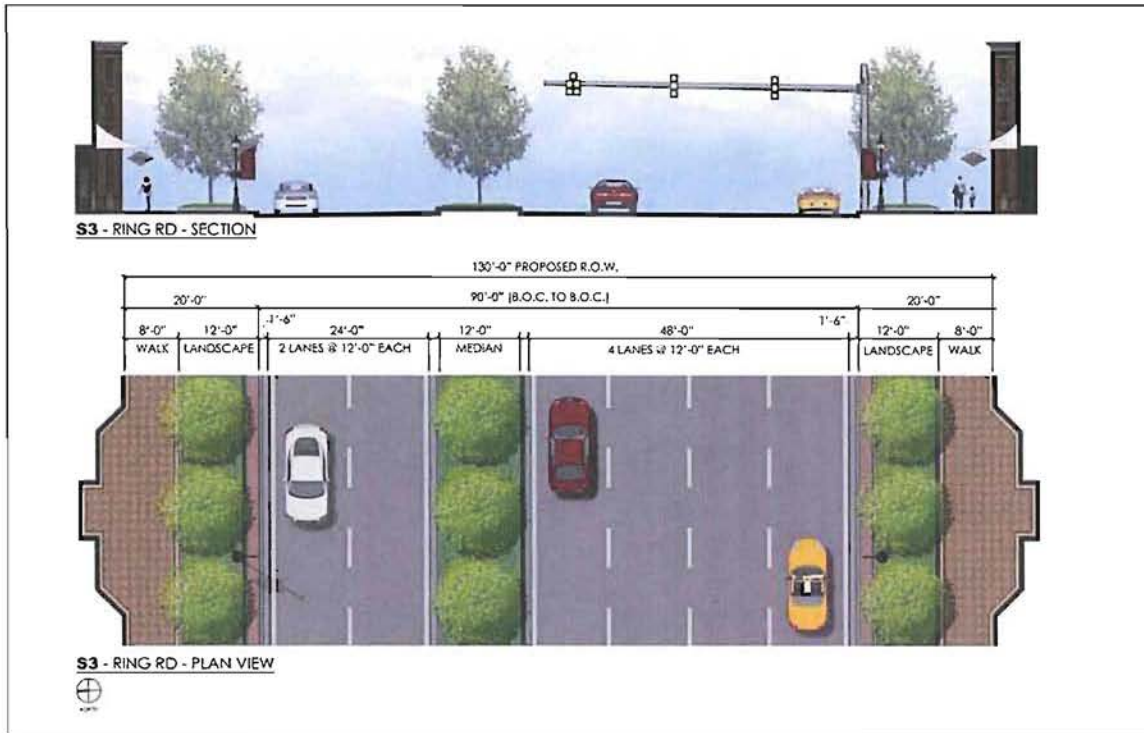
Ring Road Area Development Plan Road Cross Sections - Birchler Arroyo Associates, Inc. 2007
